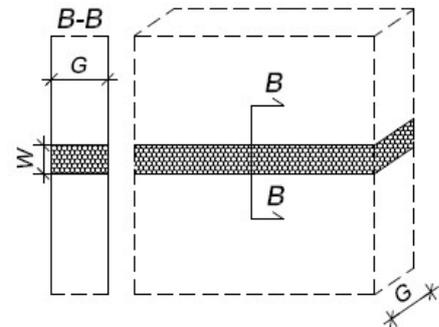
View and cross-section of the horizontal linear joint seal in wall
